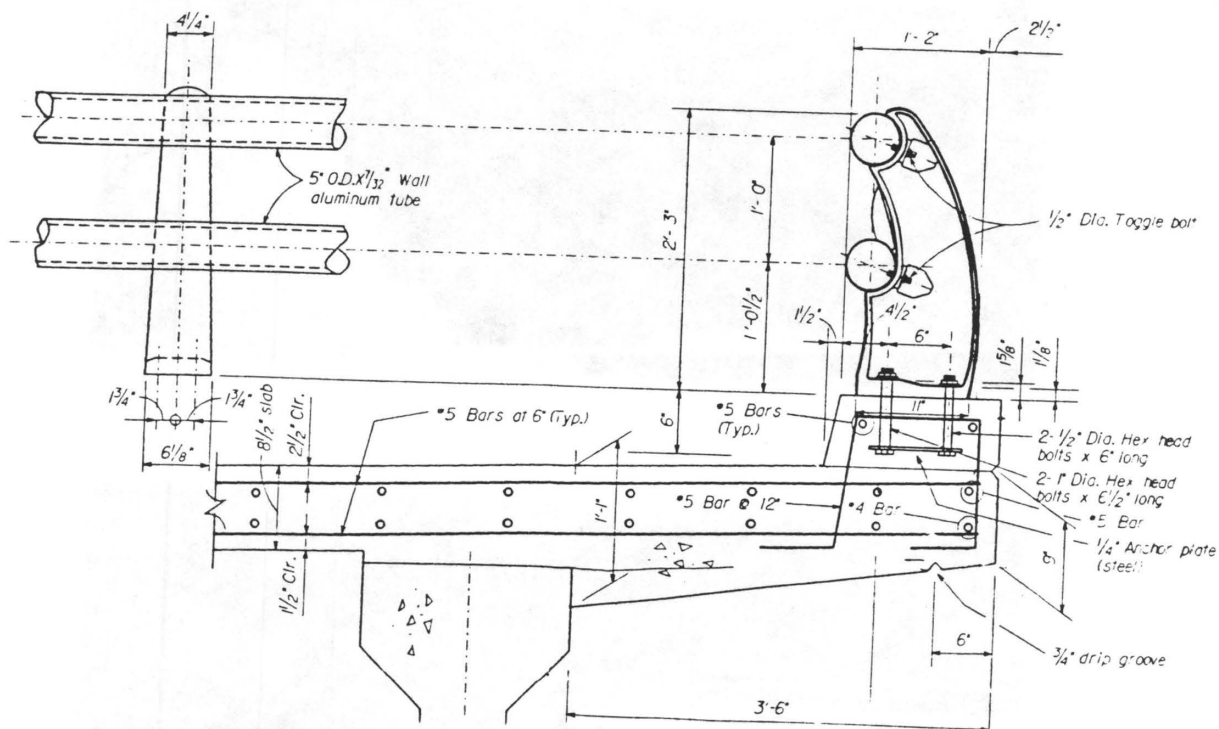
Design Details of the Foothills Parkway Bridge Rail for Test FPAR-1.
